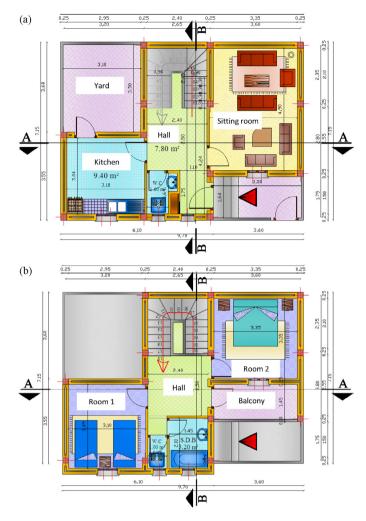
Typical plans produced by professionals (a: ground floor plan, b: first floor plan).
